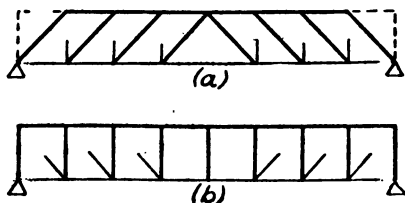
SHOWING SOCALLED HOWE & PRATT TRUSSES.
